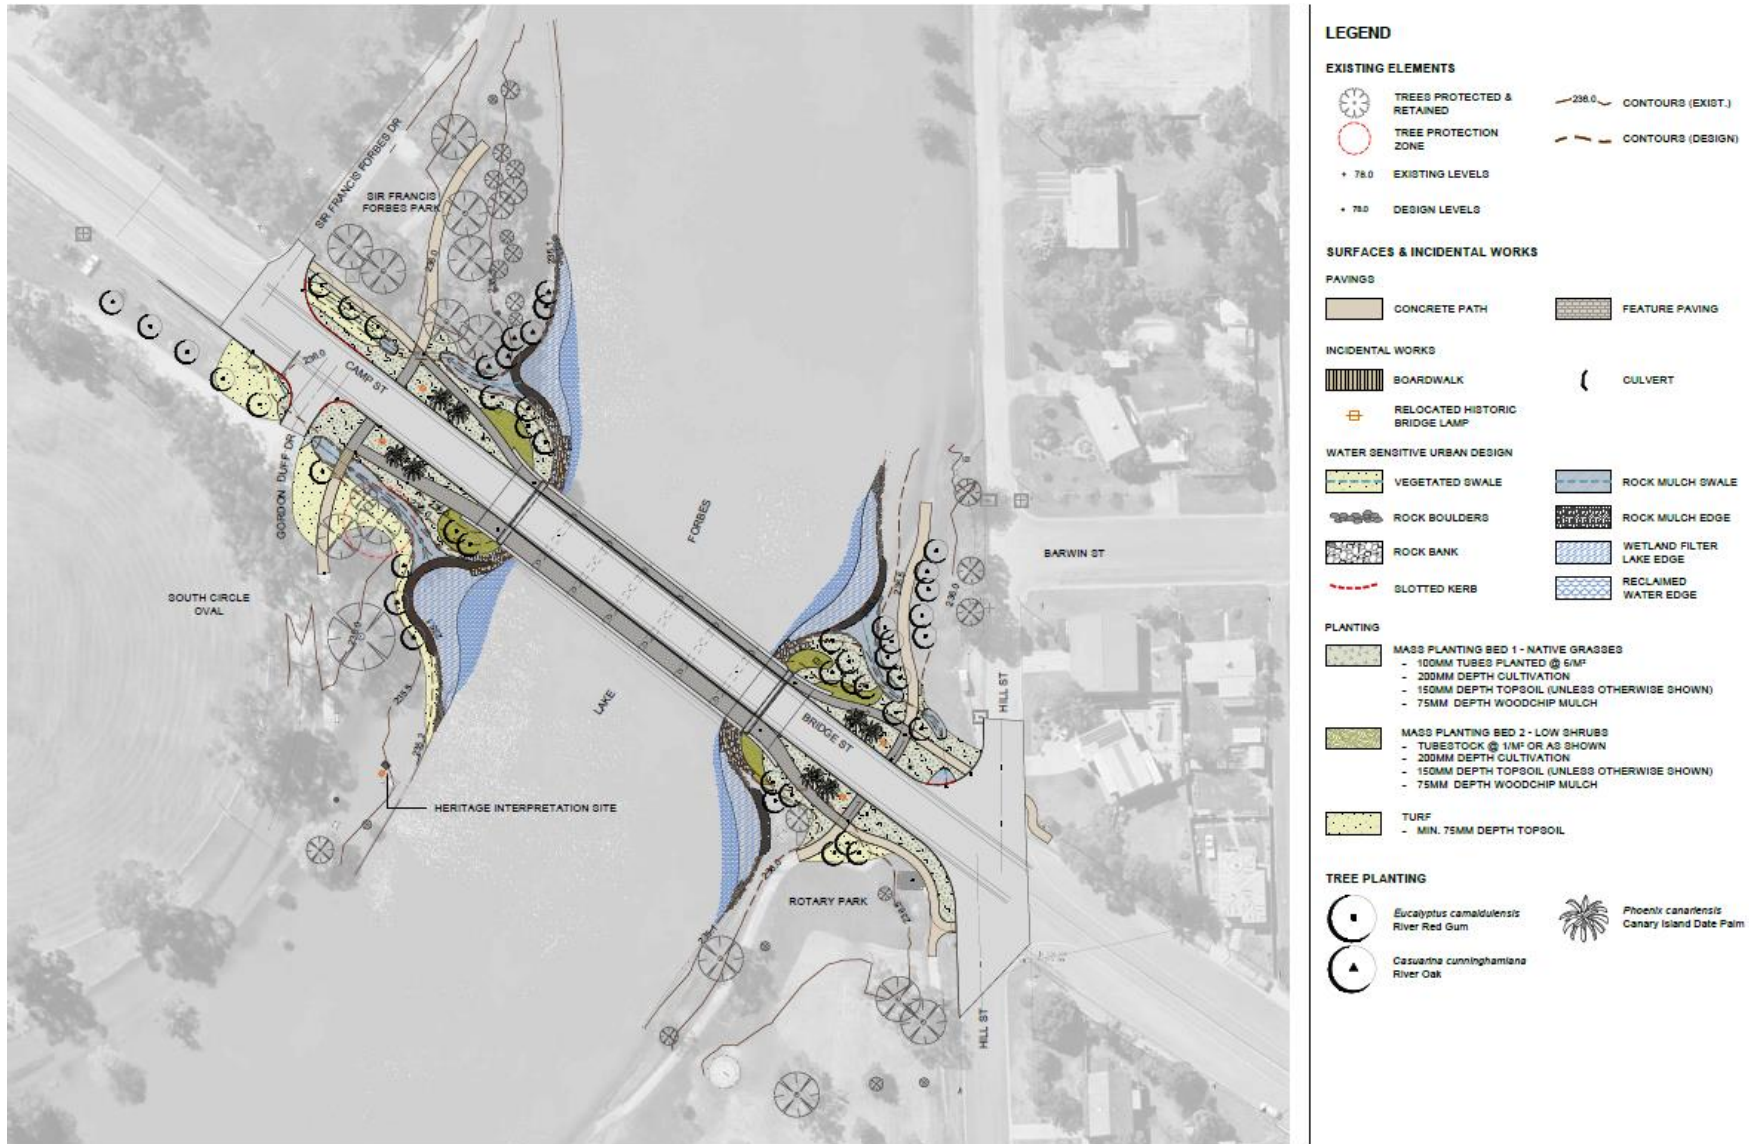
Proposal showing Camp Street Bridge, landscaping and the heritage interpretation area
